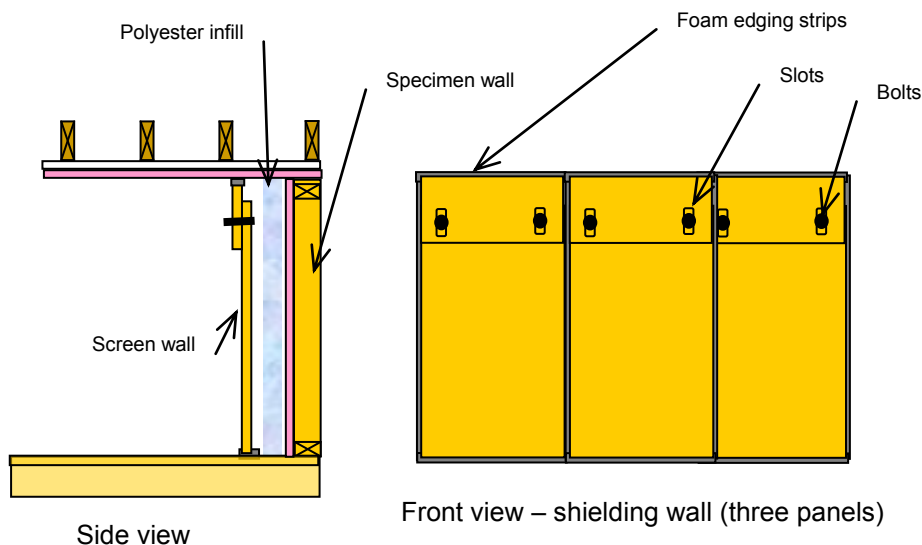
Screen wall made of 20 mm particleboard panels. Polyester fibre insulation was placed between the screen wall and the specimen wall
